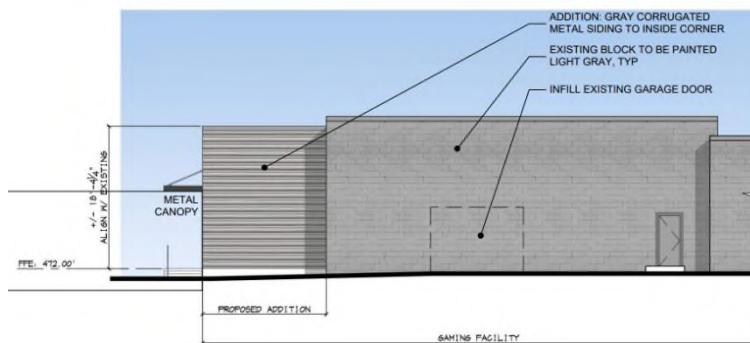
Elevation of the proposed rear addition on the western façade looking east.
